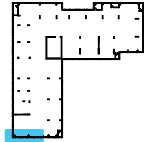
TH FLOOR AMENITY STAIR AT SW CORNER
